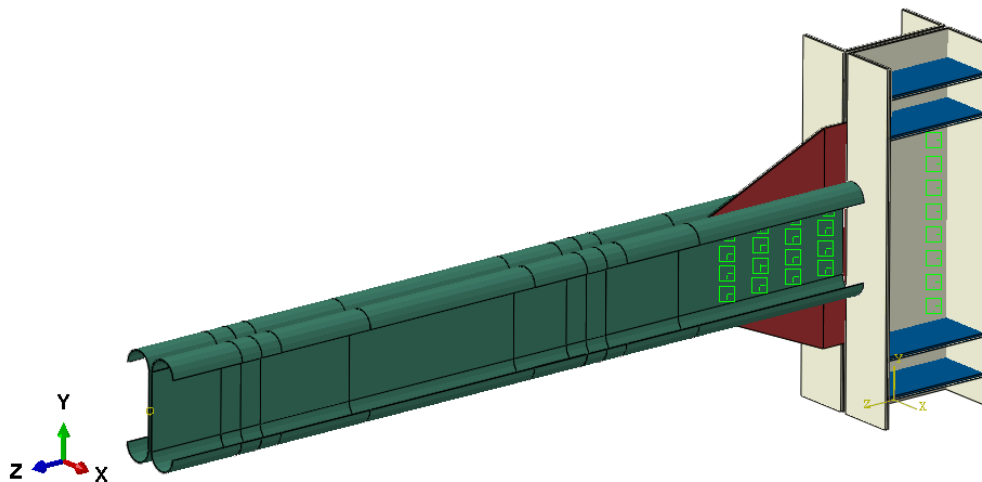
General 3D View of CFS Bolted beam-to-column connection
